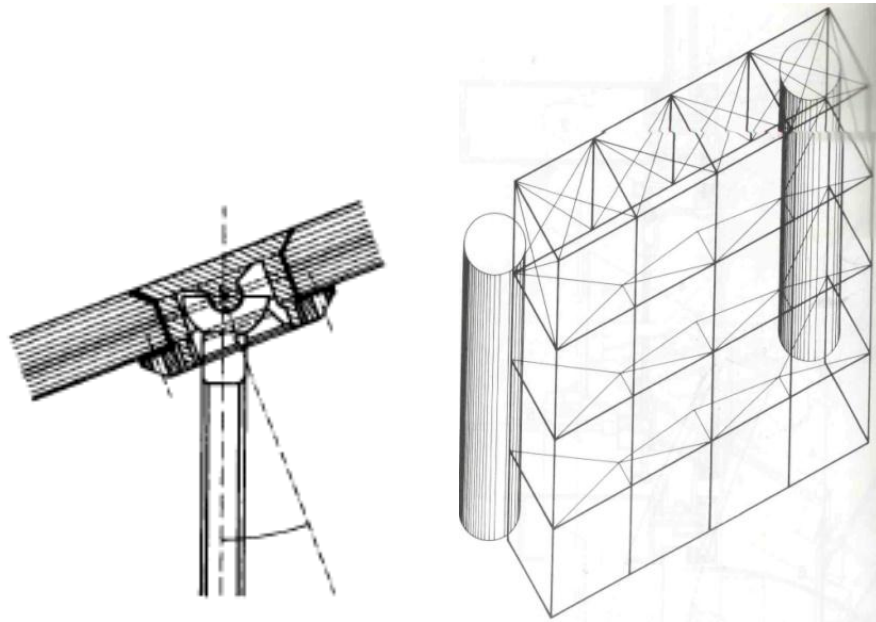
Detail of Parc La Villette Glazing and Isometric View of the Whole Structure (Alan, B., and Chris, G, 1996).
